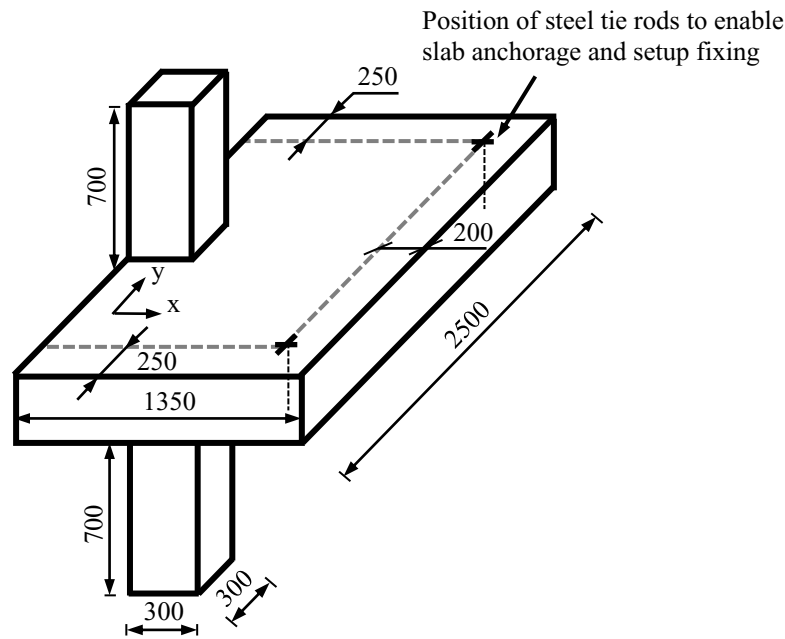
Overall dimensions of test edge connections (Unit: mm)
